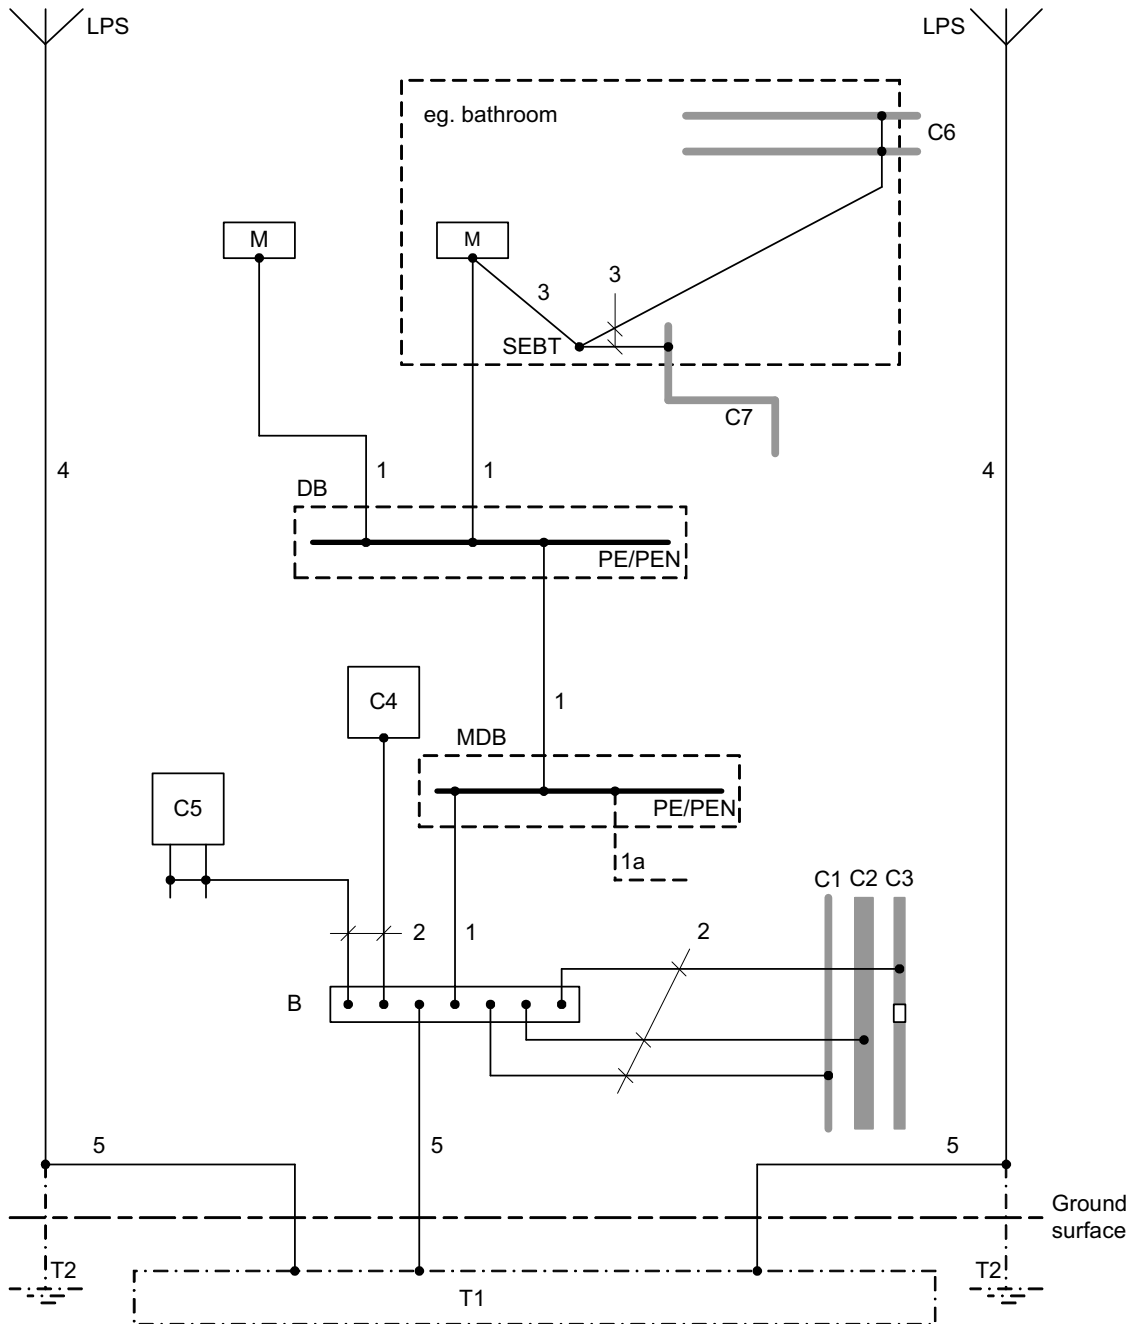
Examples of earthing arrangements in case of foundation earth electrode, protective conductors and protective bonding conductors
